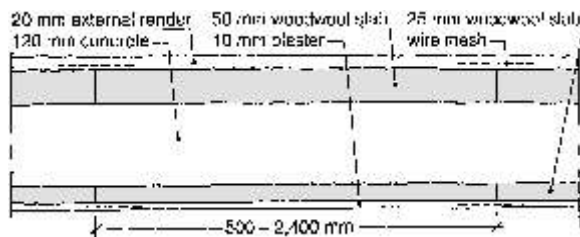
Concrete wall for a multi-storey building where the woodwool slabs are used as permanent shuttering. (Using 25 and 50 mm thick woodwool slabs gives a U-value of 1.0 W/m²K).
